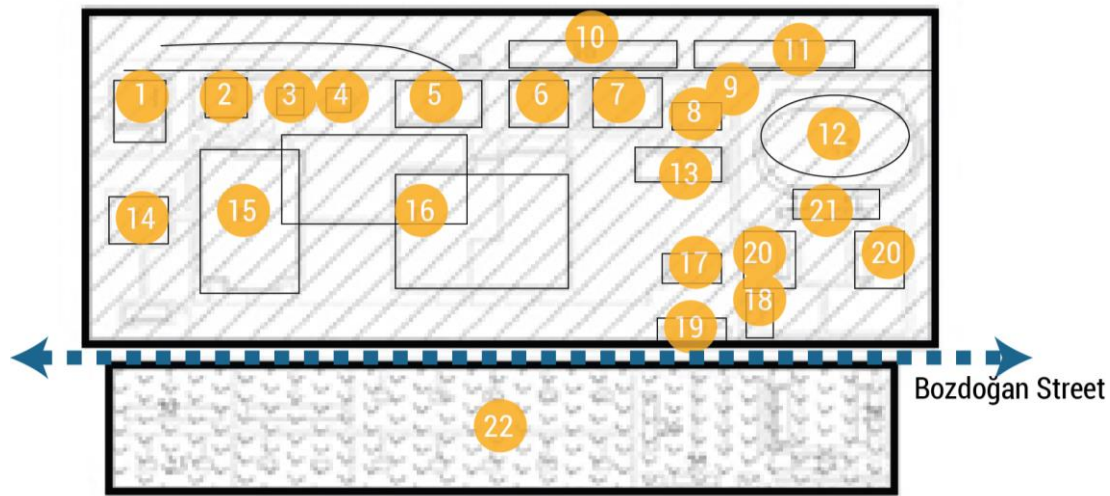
20. Nazilli Fabric Printing Factory Layout Plan (Drawing by Merve Köz, original plan from Eldeş, 2019, p. 46)
